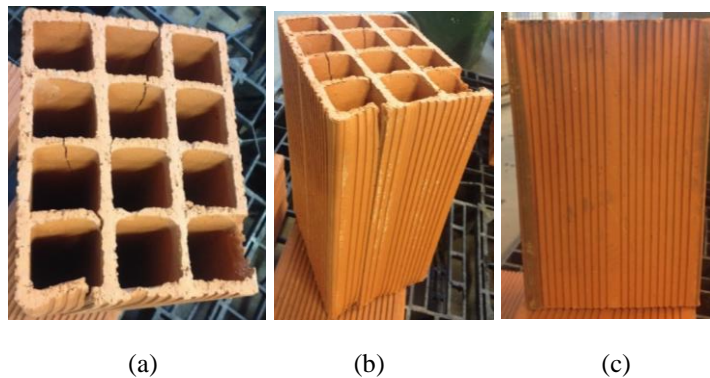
Examples of defected bricks: (a) longitudinal cracks, separation of elements, (b) faces that were not square and (c) still poor cooking.
